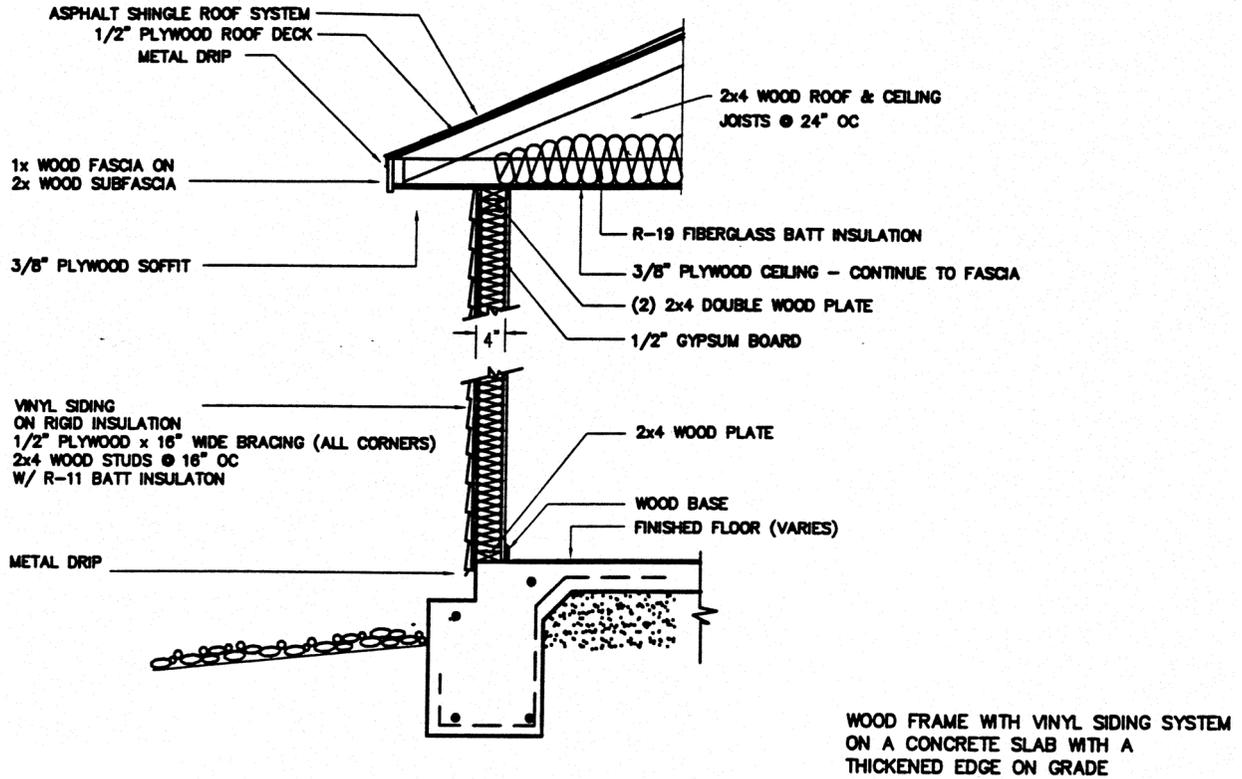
Details of test module (S-1) of current construction practice with slab-on-grade foundation.
